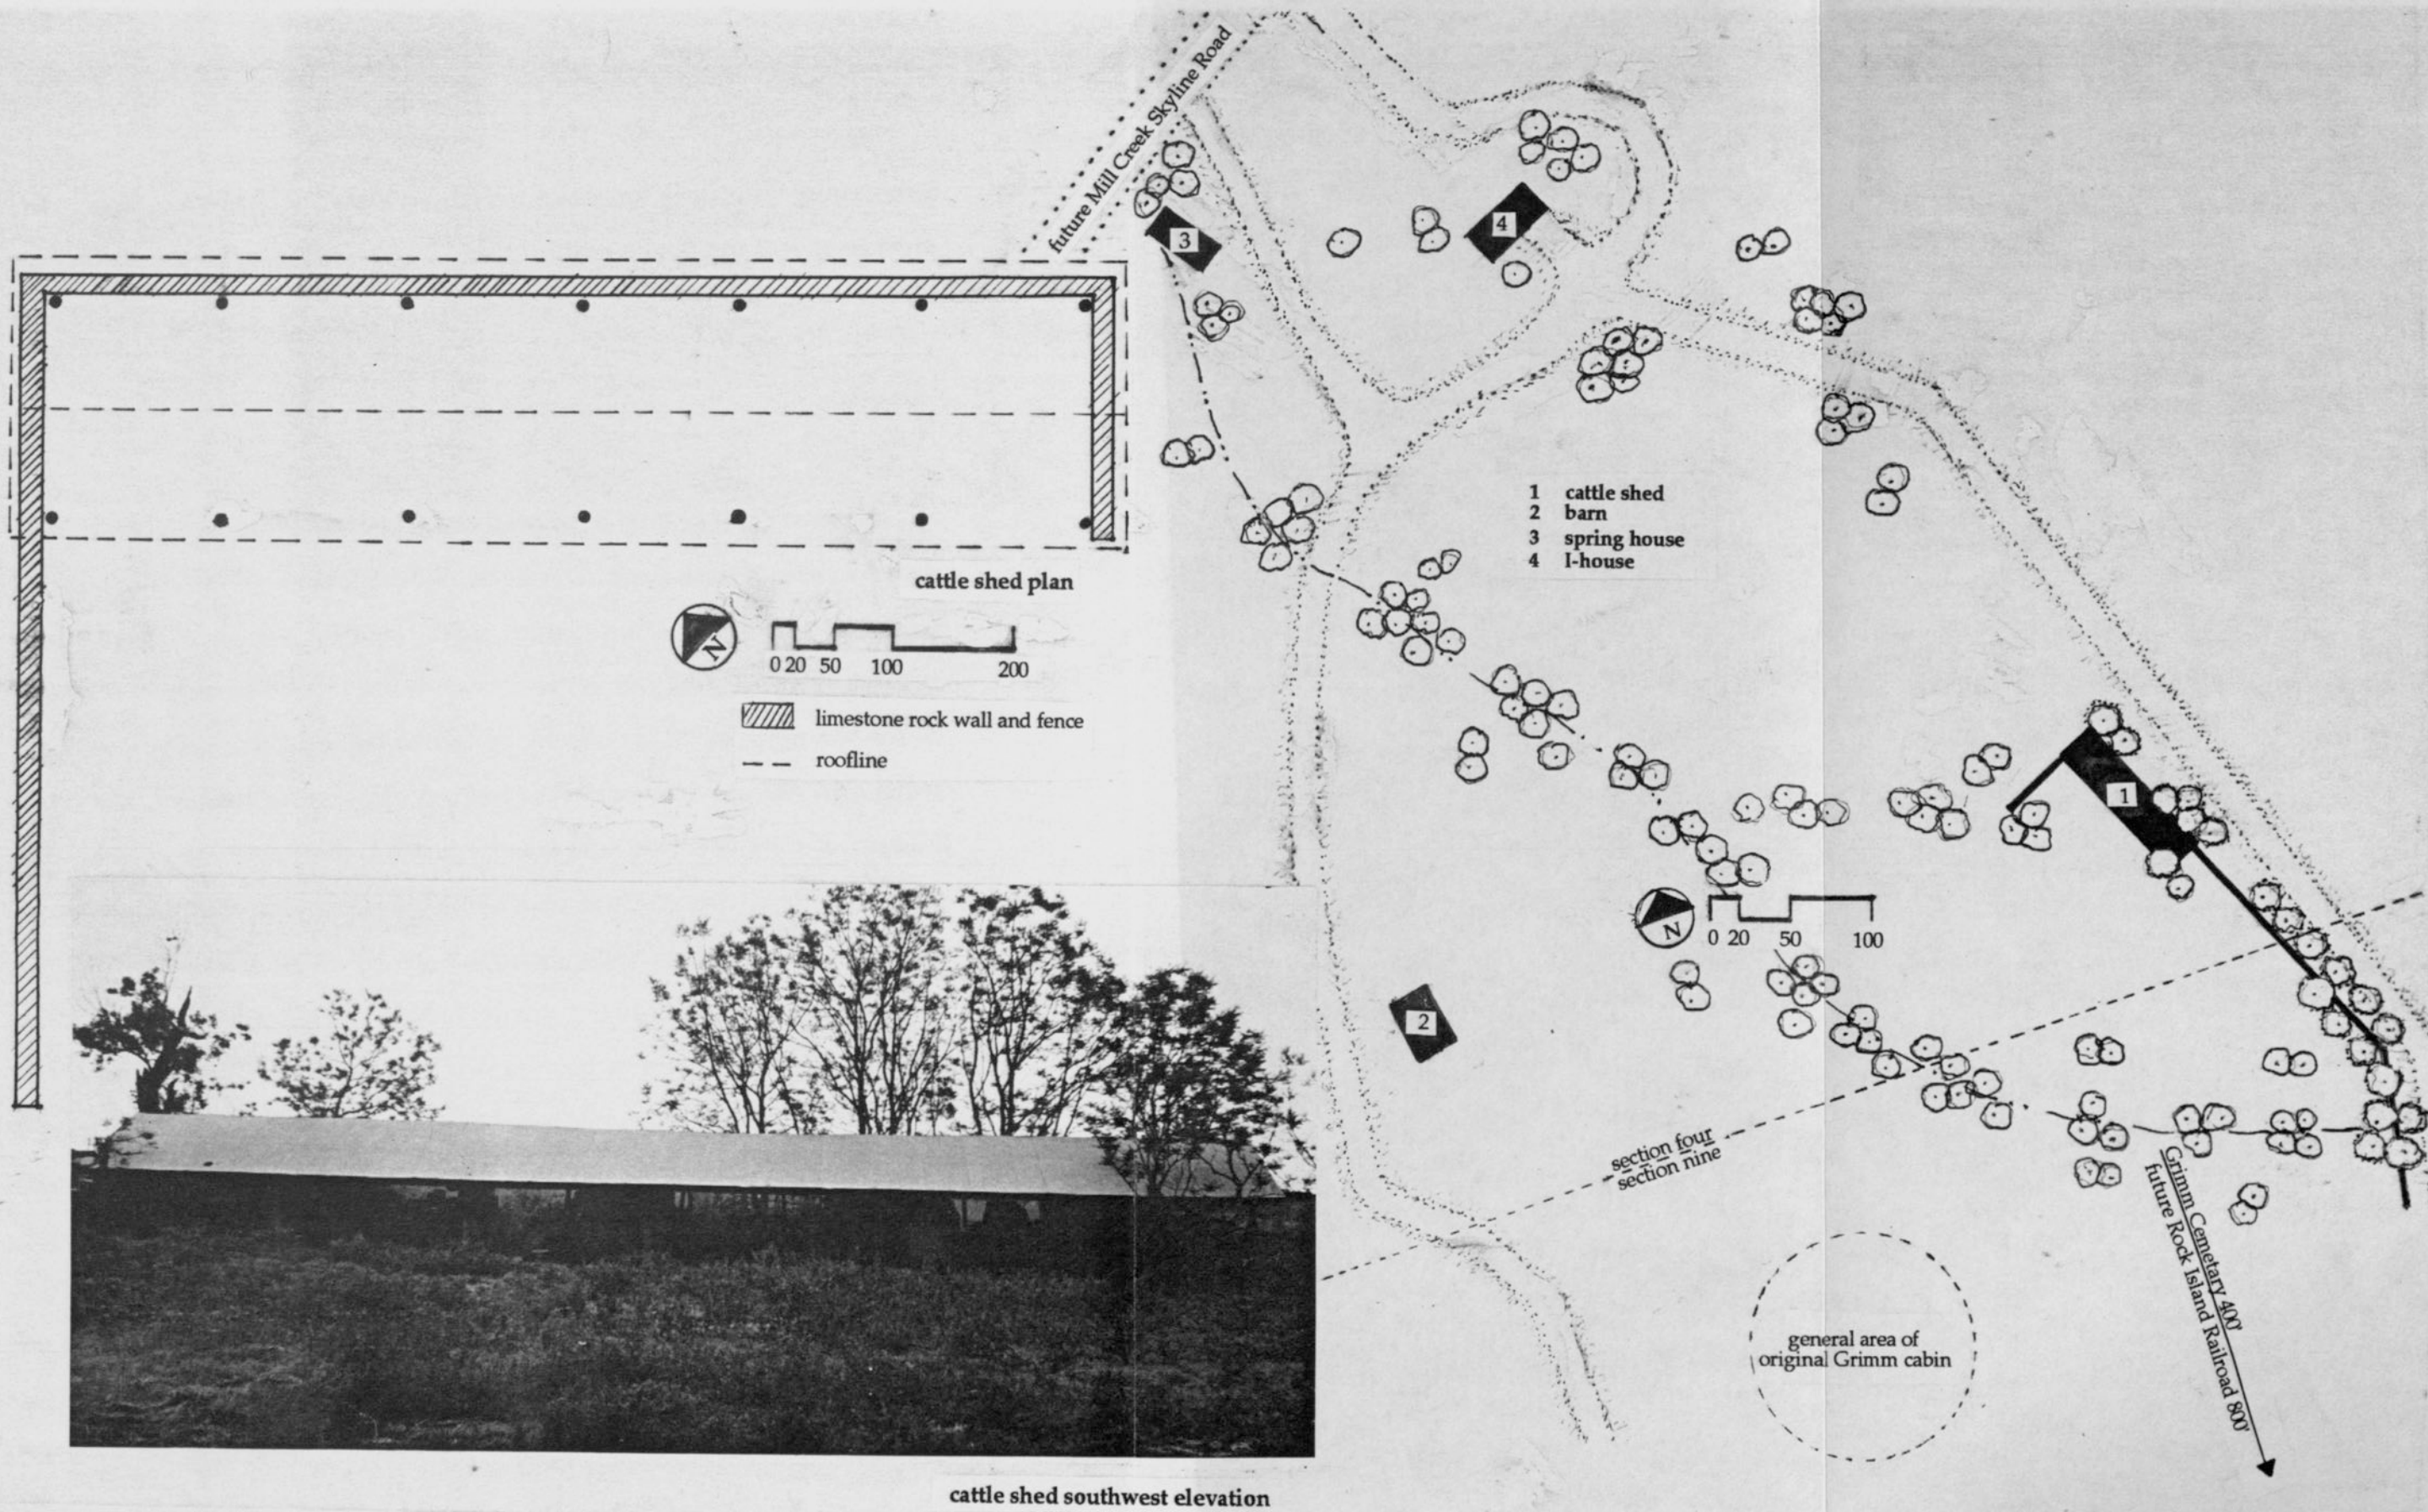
Initial buildings site plan, plan and photo of cattle shed
